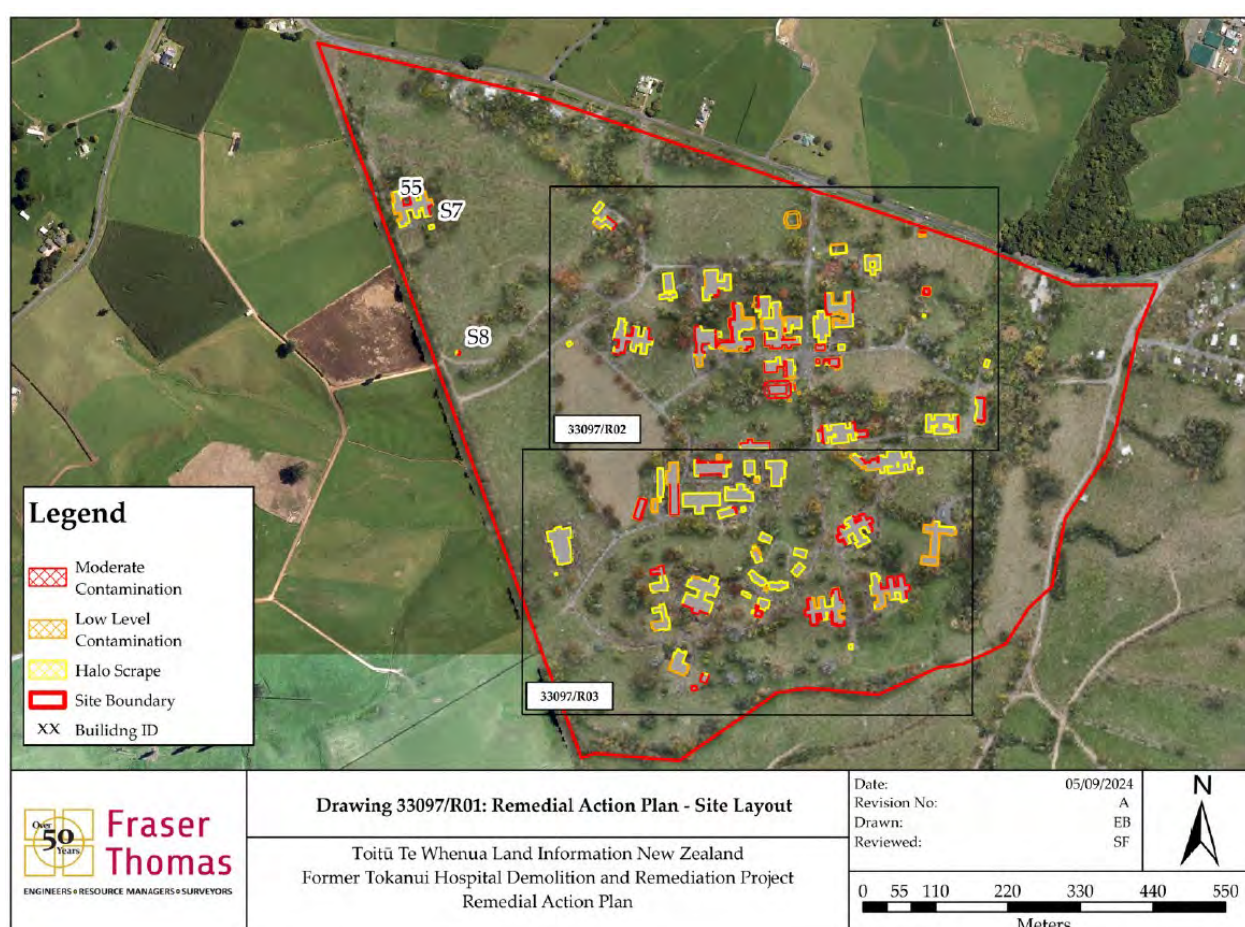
Remedial Action Plan – Site Layout (1 of 3)
